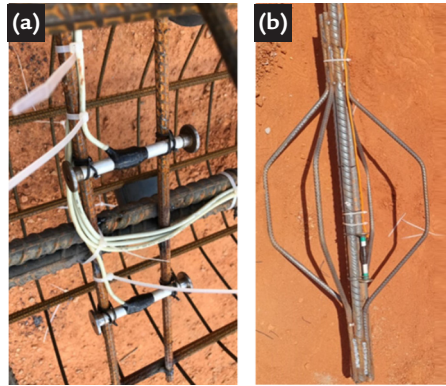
Typical installation of load cells in the steel cage: (a) reference sensors at the pile top, and (b) at the pile tip.
